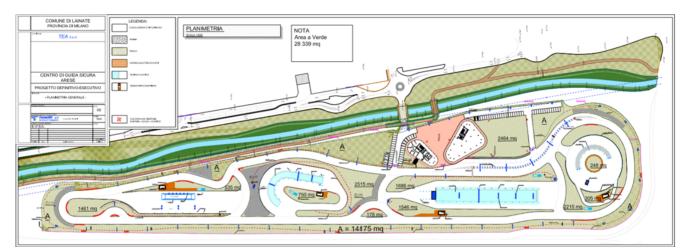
planimetry of ACI Safe Driving Centre in Lainate (Milan)
